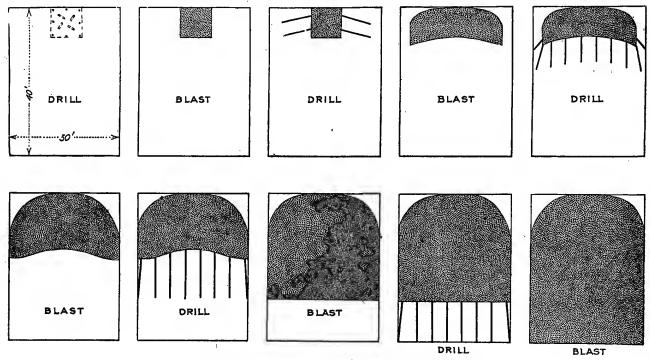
SYSTEM FOR WORKING OUT GANGWAYS
